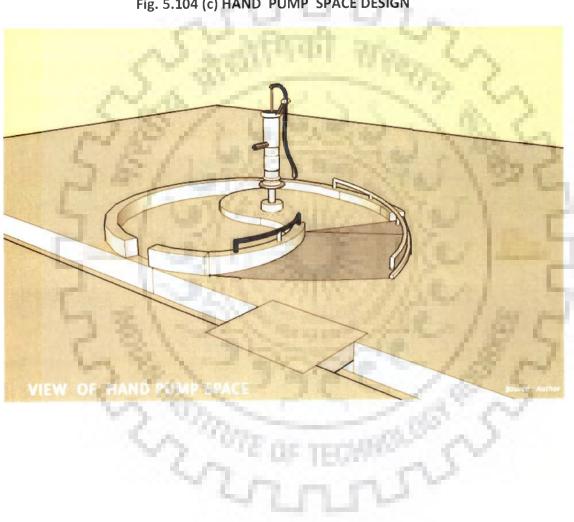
(c) HAND PUMP SPACE DESIGN
